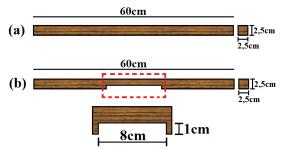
Dimensions of the specimens: (a) Flawless; (b) defective
